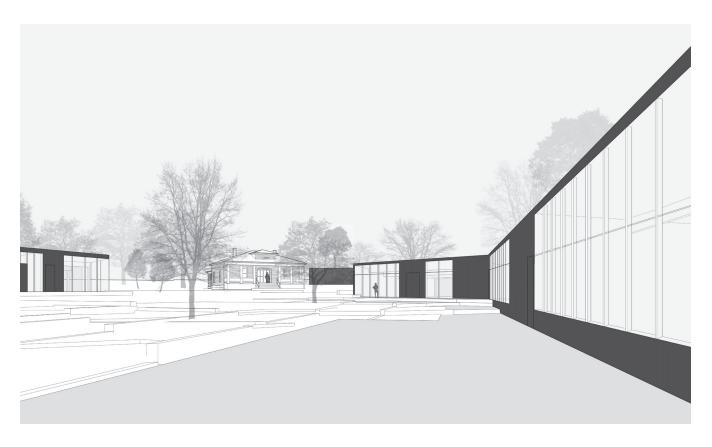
Bent bars define exterior rooms with long views of the landscape and Sunny Slope house. Image credit Anna Leach.
